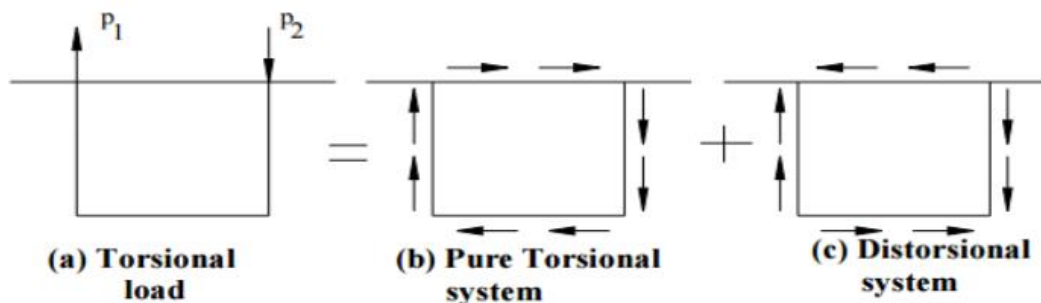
Resolution of Torsional load (<https://theconstructor.org/structures/behaviour-of-box-girder-bridges/2194/>)
